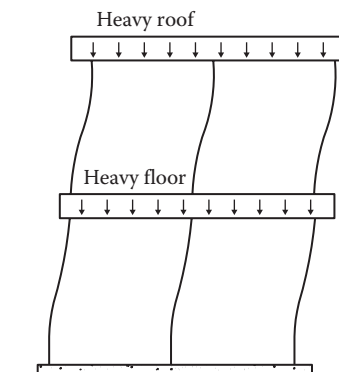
Heavy floor collapse. Major force is due to gravity loads due to inertial force at each floor. If column fails, heavy floors collapse.
